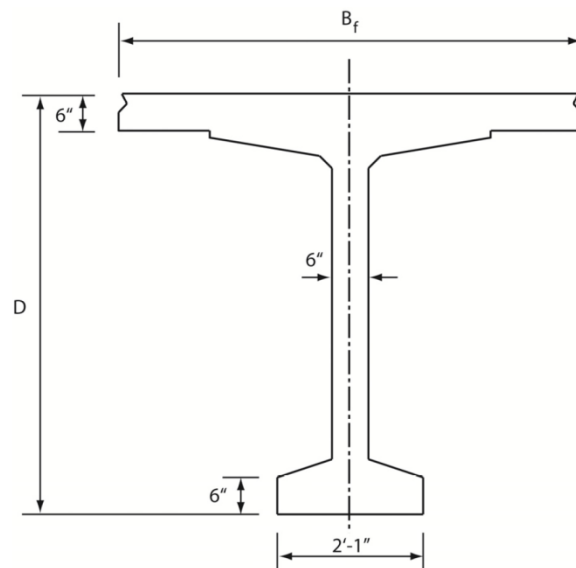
Standard Alaska-Style Precast DBT girder section (DOT&PF 2017)
